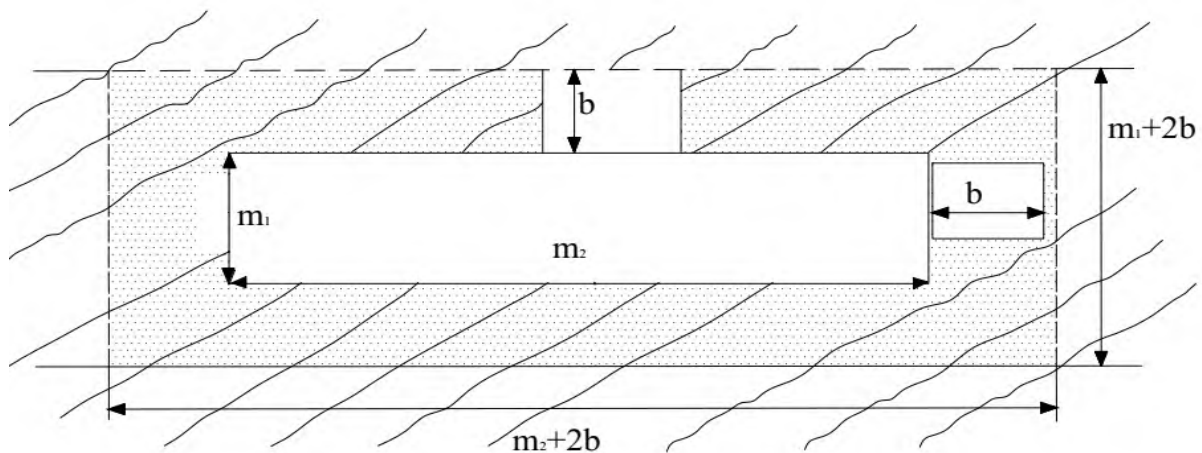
Installation of anchors in the walls of a working with a quadrangular cross section.
